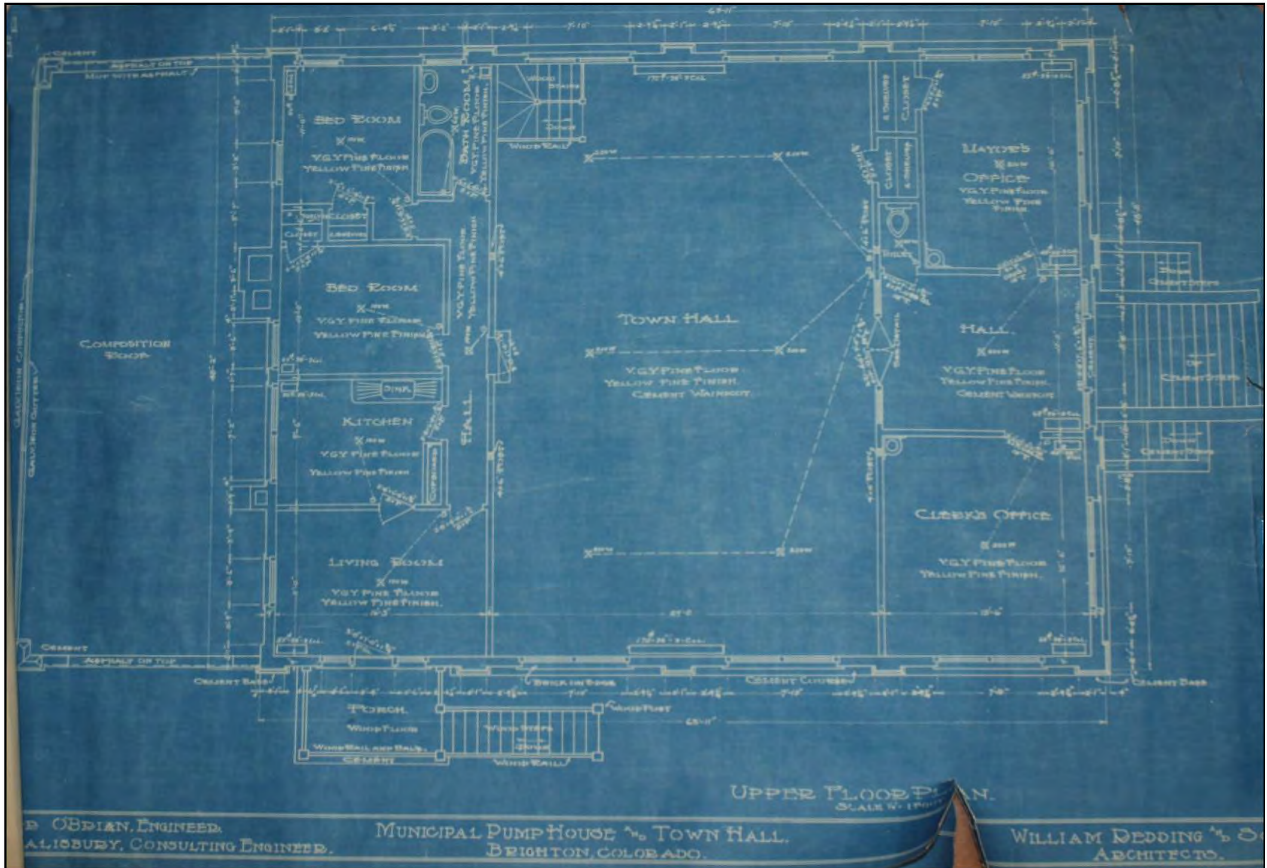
"Upper Floor Plan," 1918 blueprints, William Redding & Son, Architects. Source: City of Brighton, Historic Preservation Commission.
